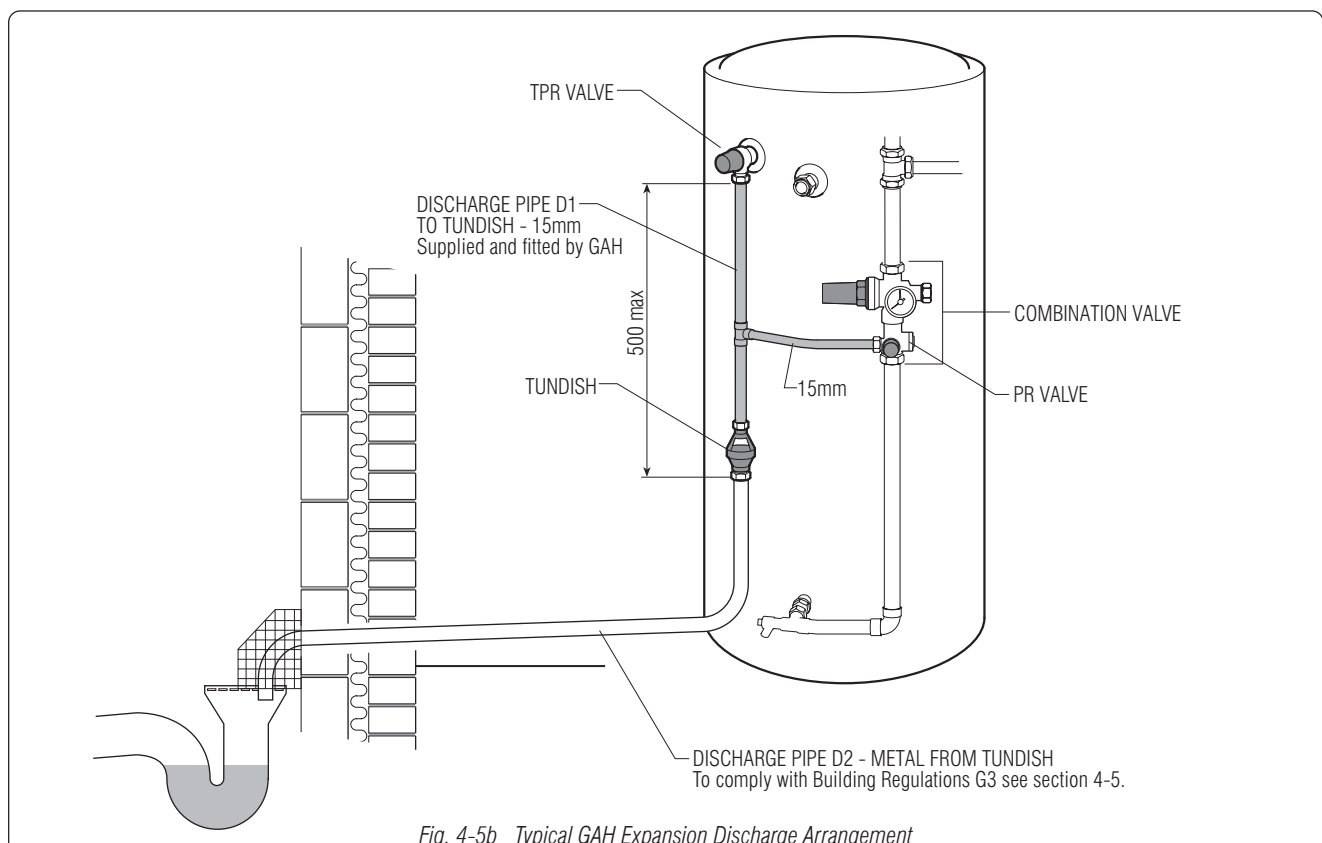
Typical GAH Expansion Discharge Arrangement
